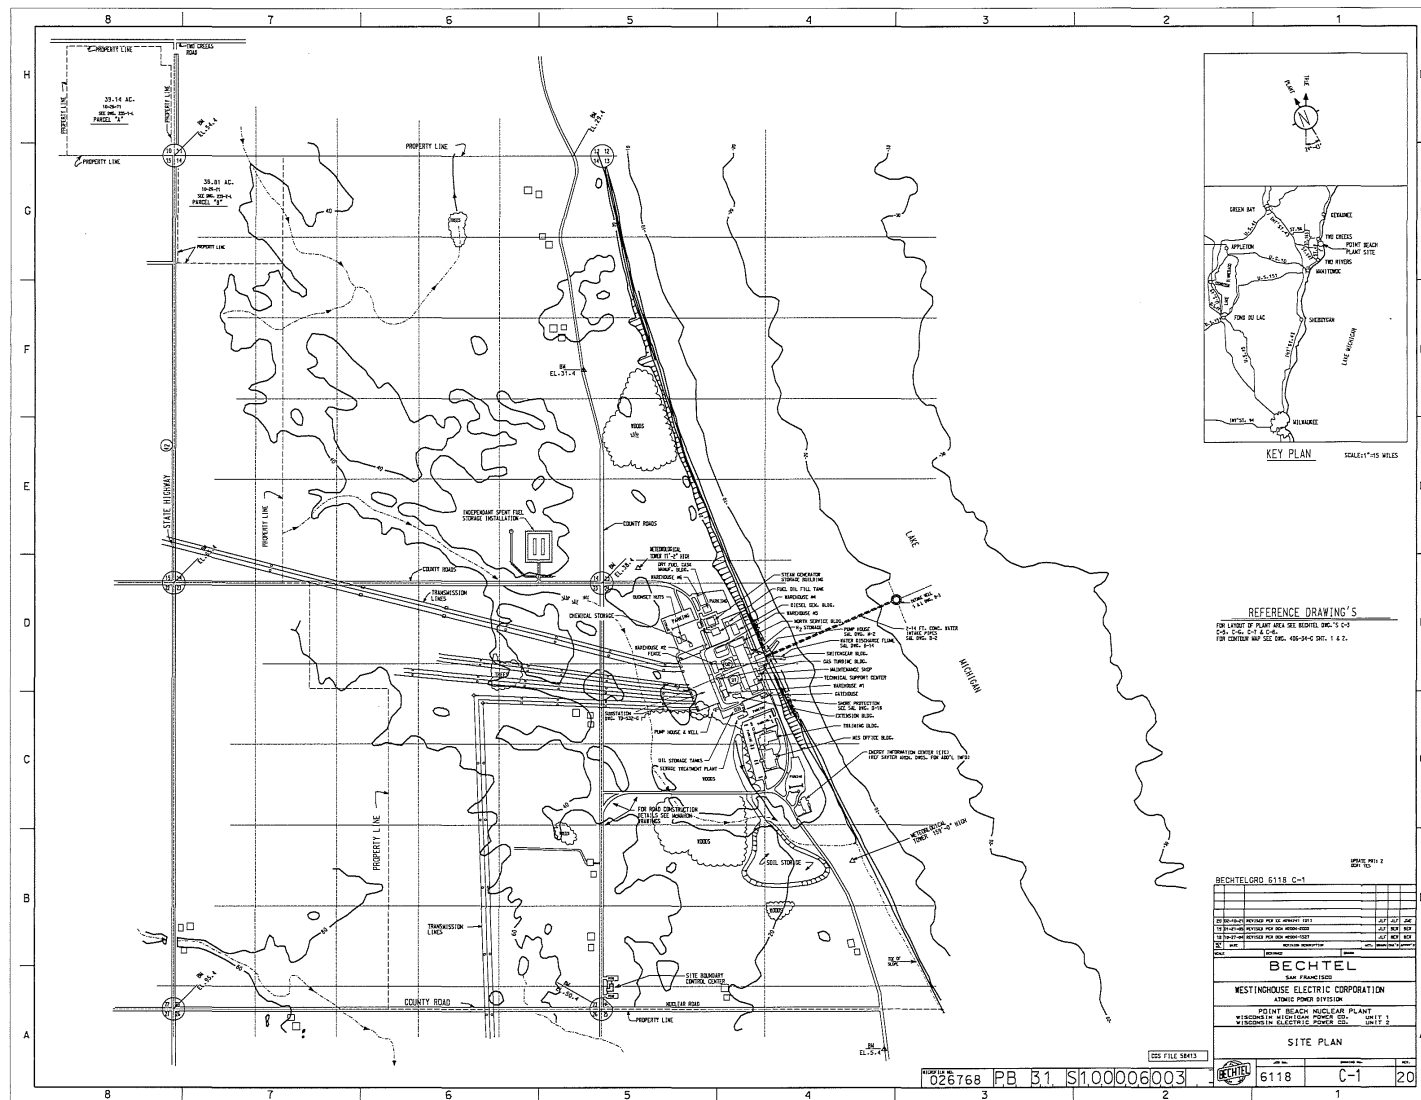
UNITS 1 & 2 SITE PLAN
